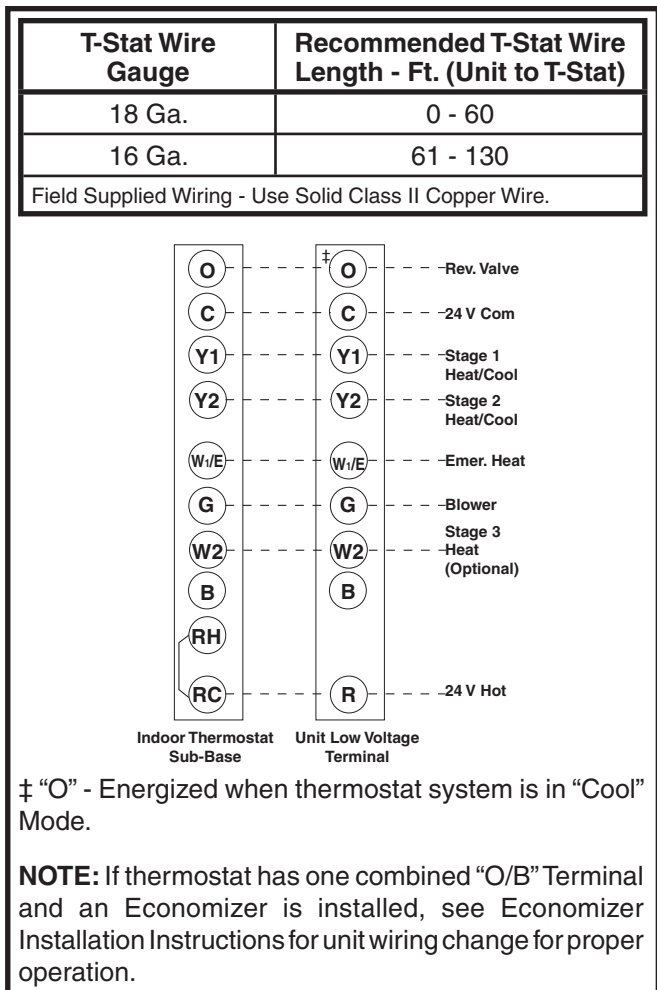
Typical Connections - 2 Stage Cool/3 Stage Heat T-Stat
